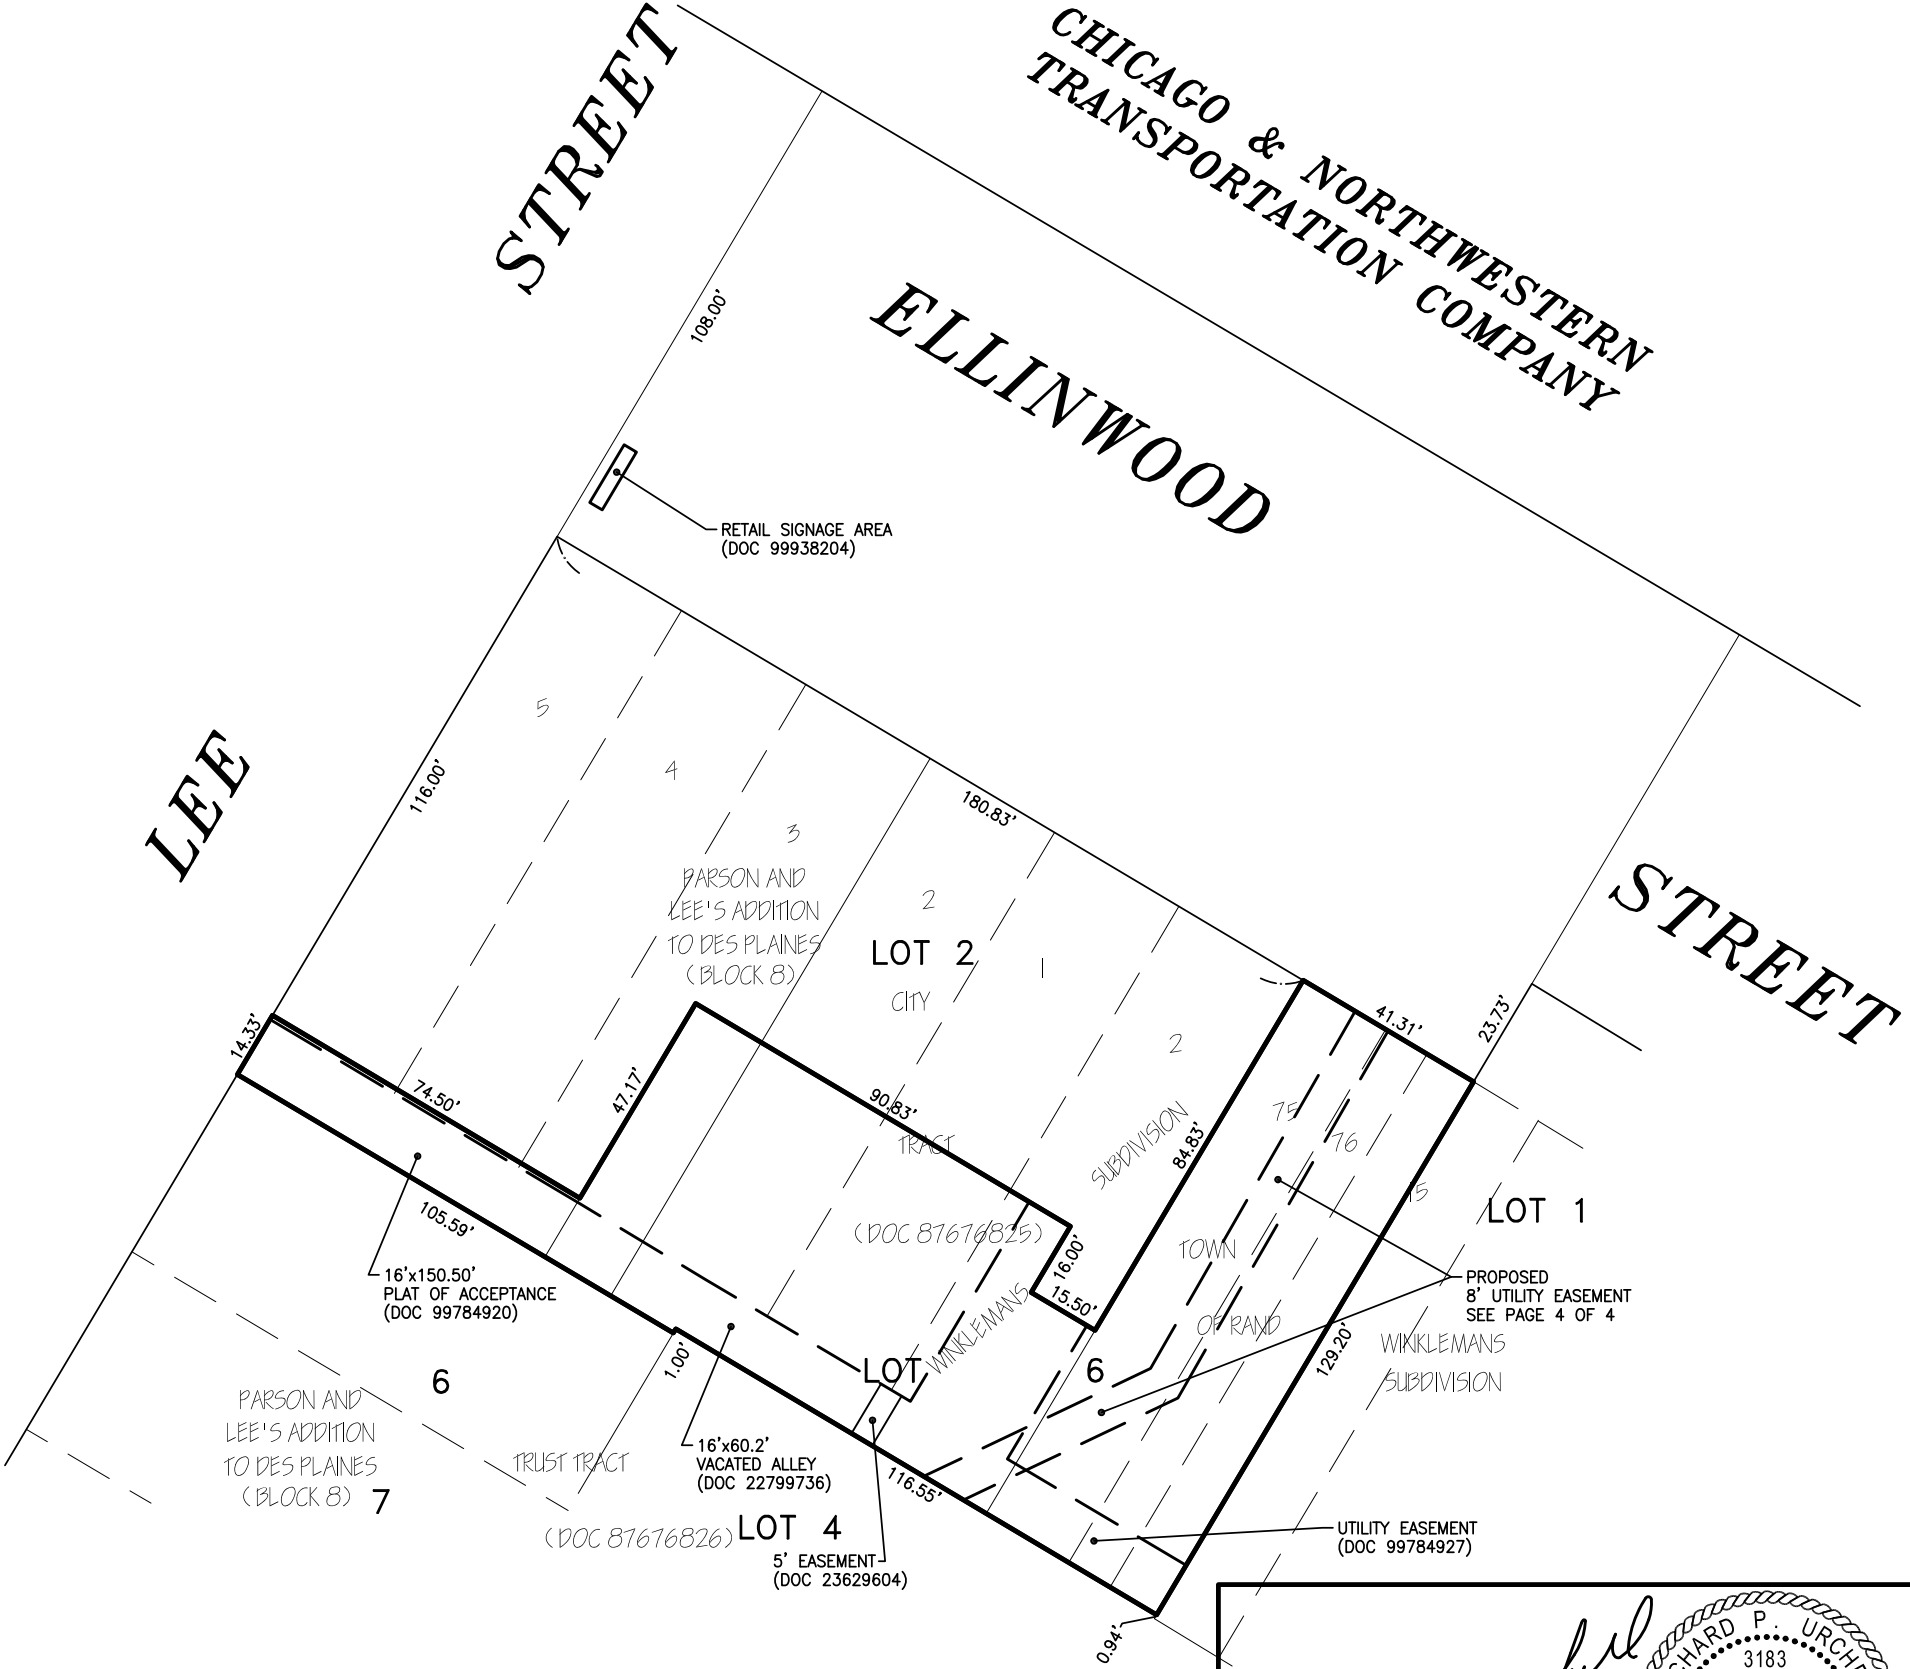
EXHIBIT B - Site Plan of Proposed Verizon Electrical Line Installation
